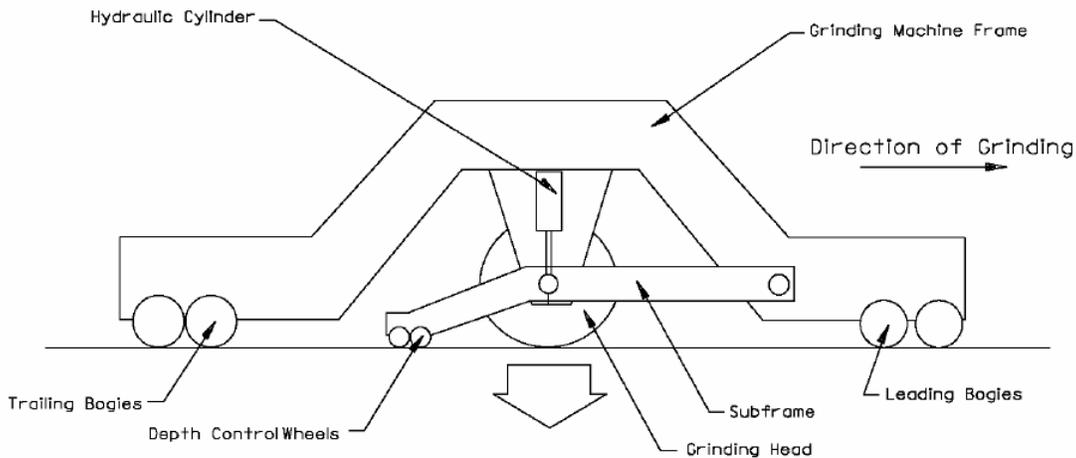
Schematic of grinding machine (MnDOT, 2005)
